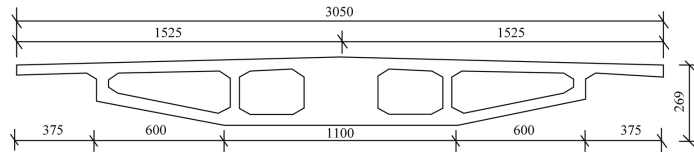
Cross-sectional diagram of the main bridge of Jinzhou Bridge (1) (mm)
